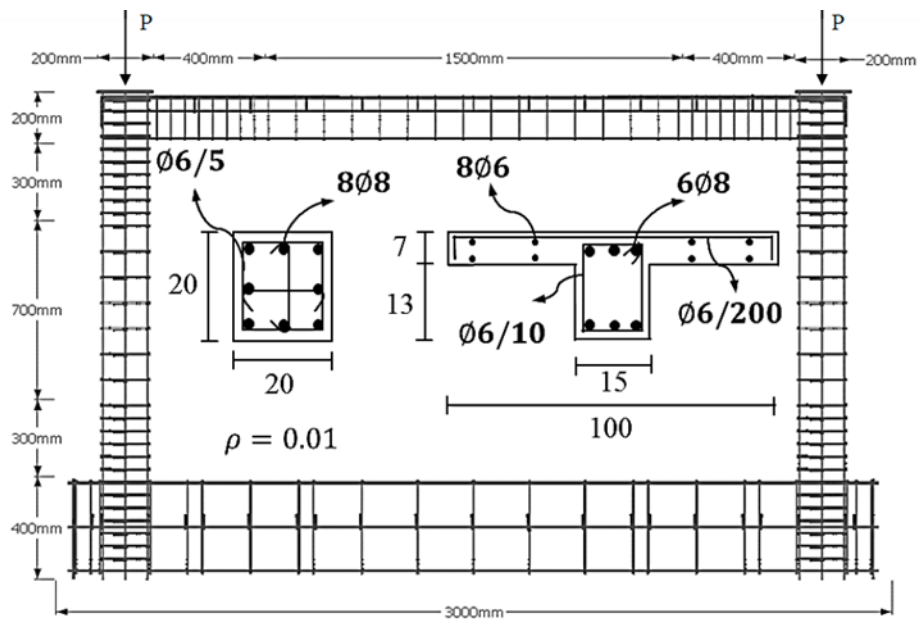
Reinforcement Details of Reinforced Concrete Frame
